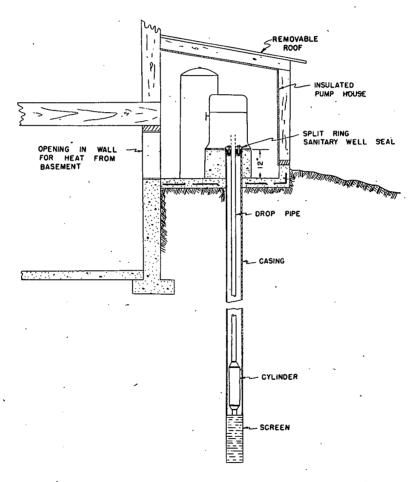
Insulated pump house attached to dwelling with opening in basement wall to supply some heat.
